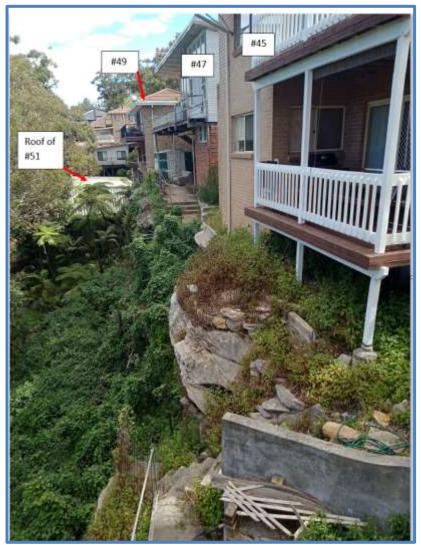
Photo looking south from 45 Yarran Road, Oatley.
